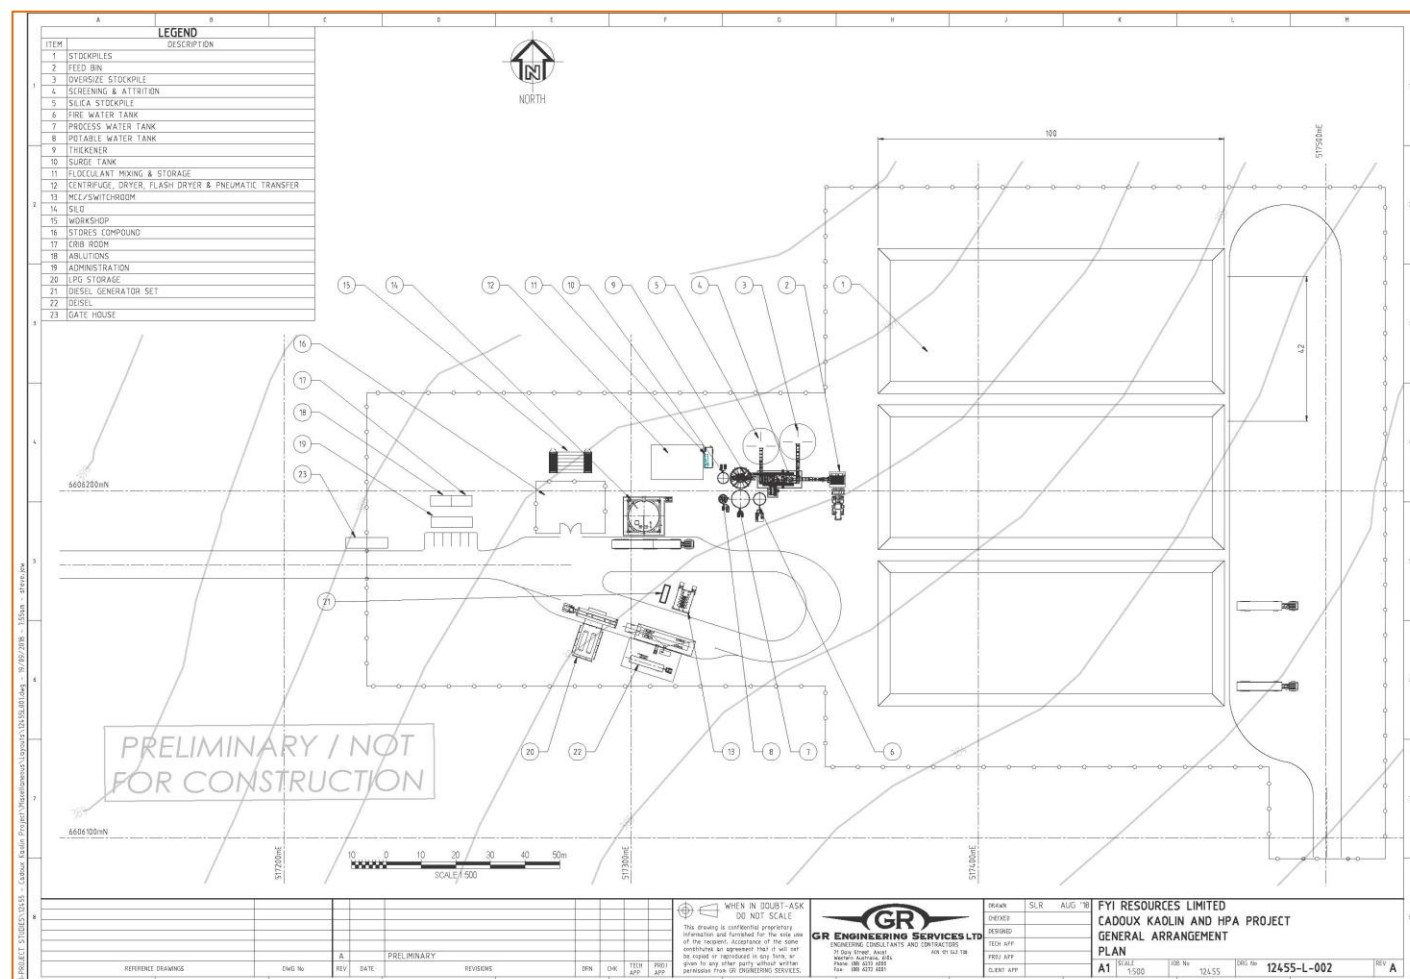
Preliminary site layout Cadoux - Beneficiation
